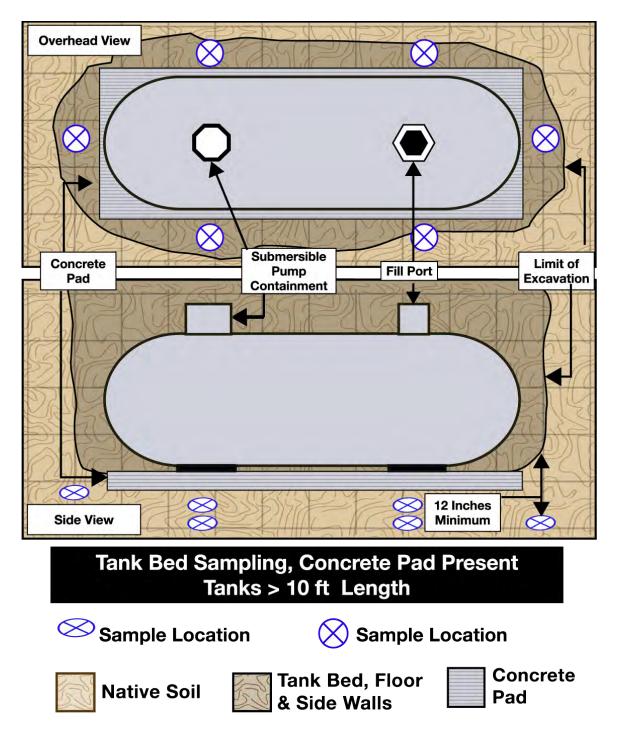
Tank bed sampling for a single tank greater than ten feet in length, with concrete or "Deadman" anchors present.
